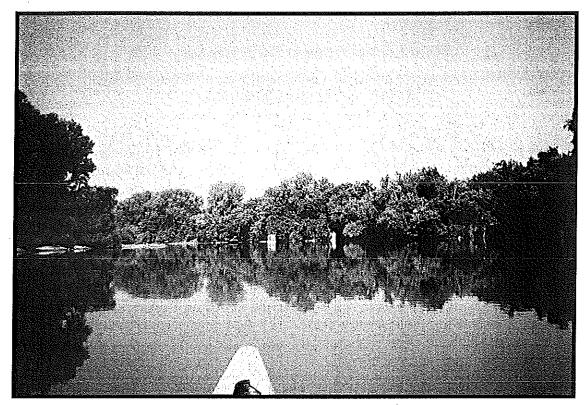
Looking upriver at piers of Beard's Bridge/Piedmont Toll Bridge.
